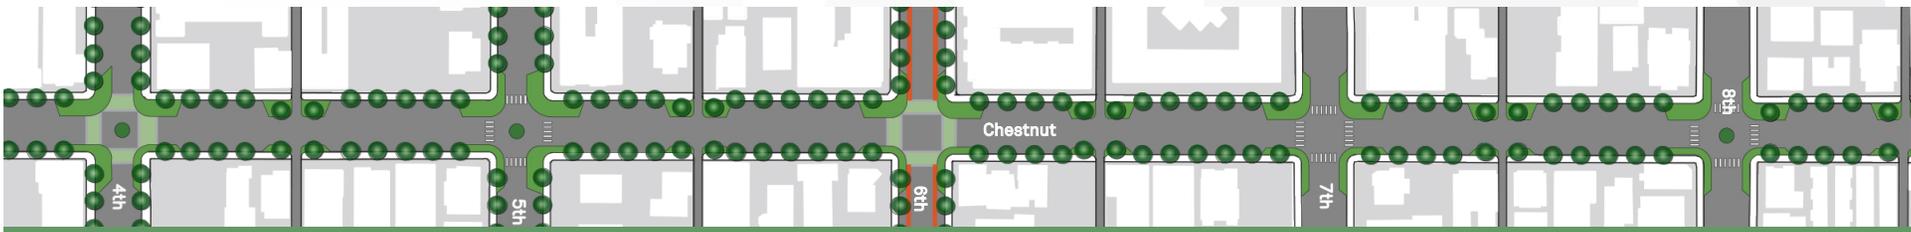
SEGMENT 2 - Chestnut Avenue- 4th Street to 7th Street
